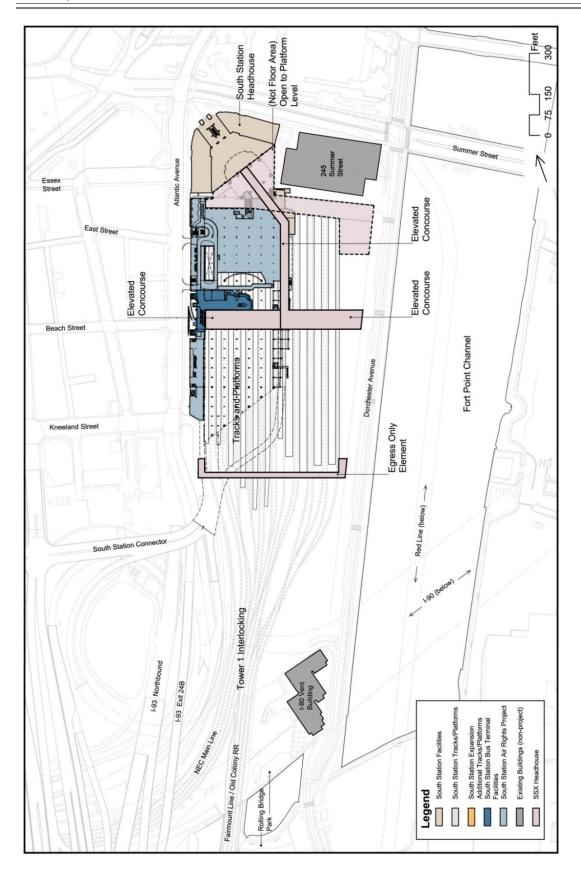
South Station Site – Proposed Elevated Concourse Level
